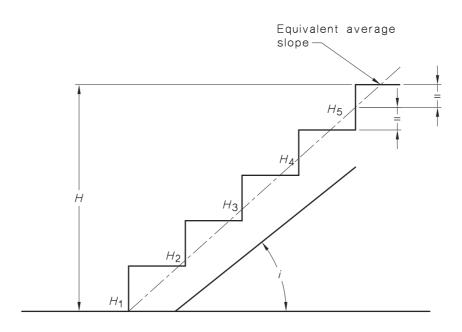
RETAINING AND REVETMENT STRUCTURES
